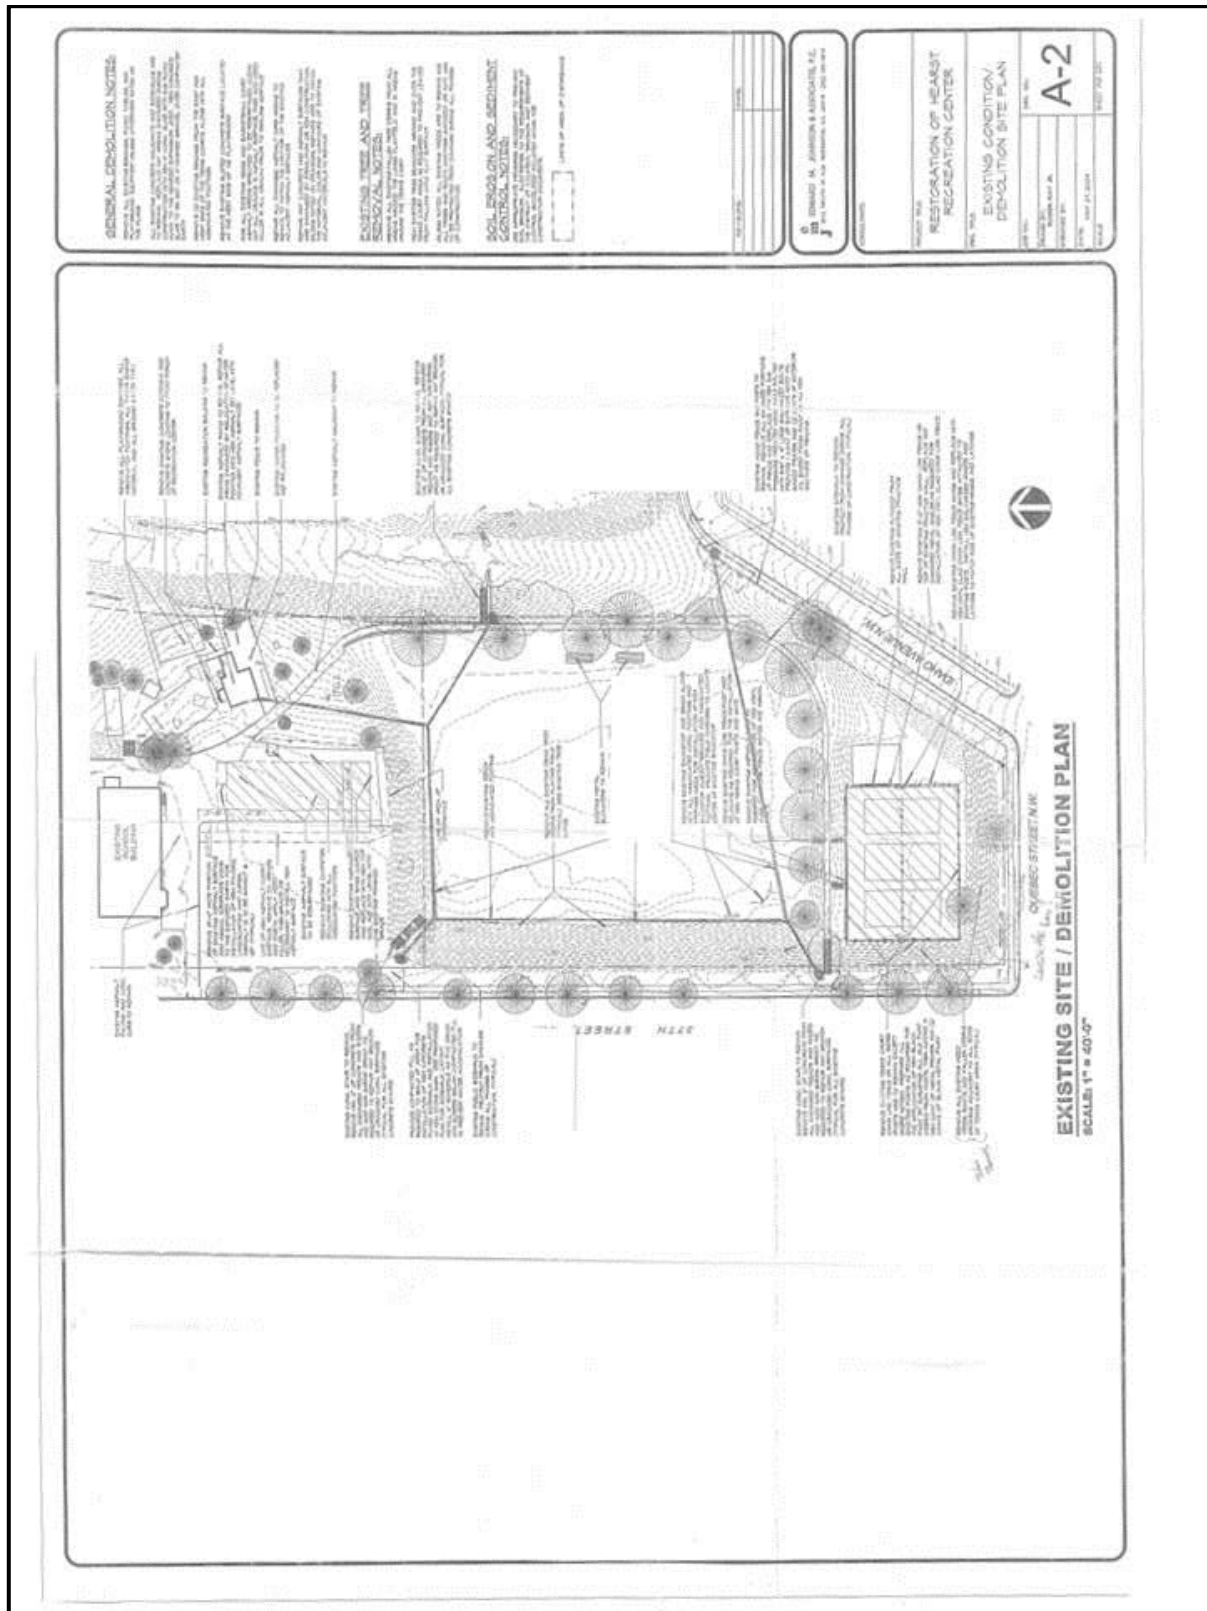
Hearst Park Existing Site Plan with proposed improvements noted. (Map provided by Cox Grae + Spack Architects)
